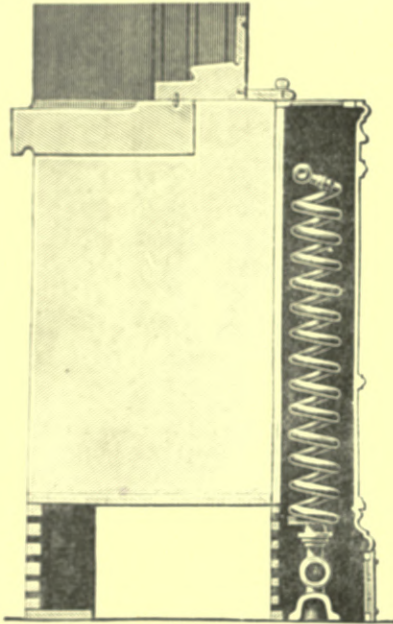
Section showing Coil Radiator in Cast-iron Case, with Air-inlet, &c.
